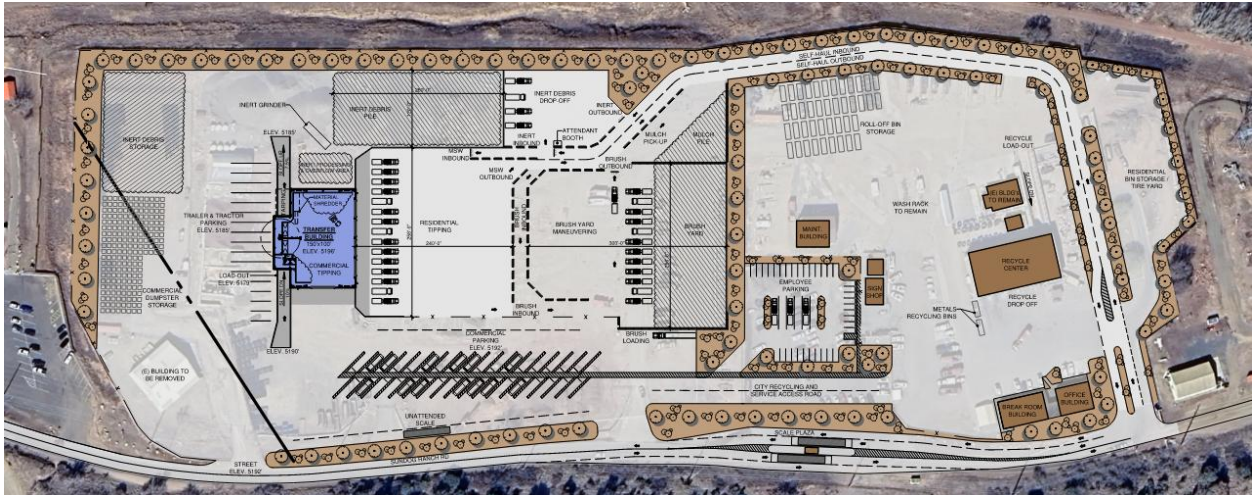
Transfer Station Schematic Site Master Plan Overall Layout
